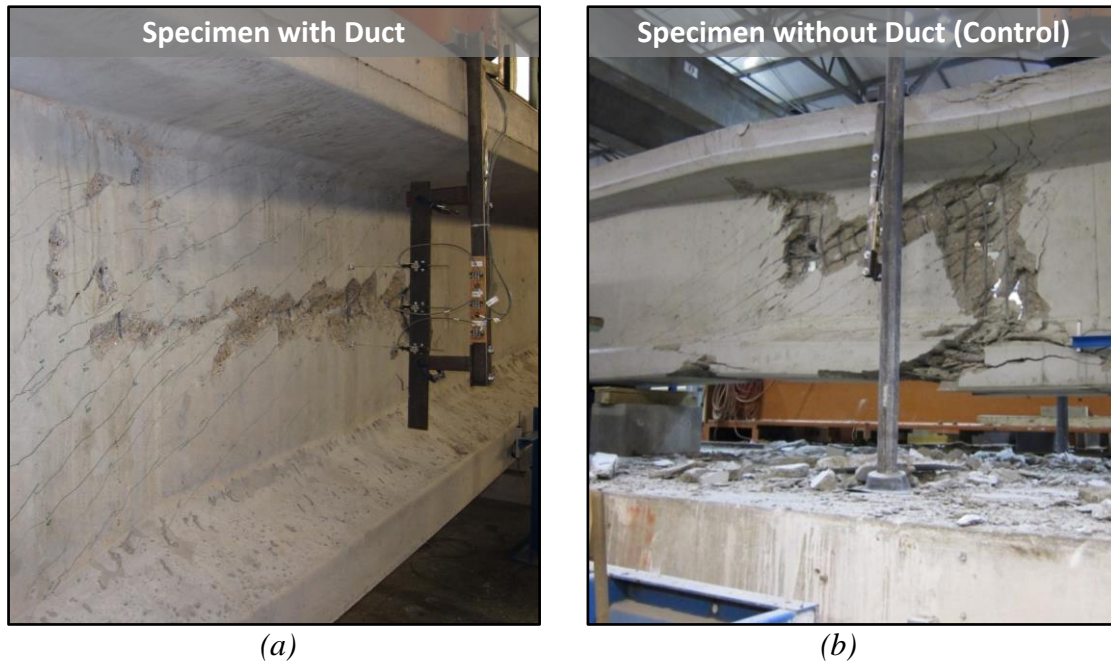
I-girder specimens after failure – (a) with post-tensioning duct; (b) without post-tensioning duct (adapted from Moore, 2014)
